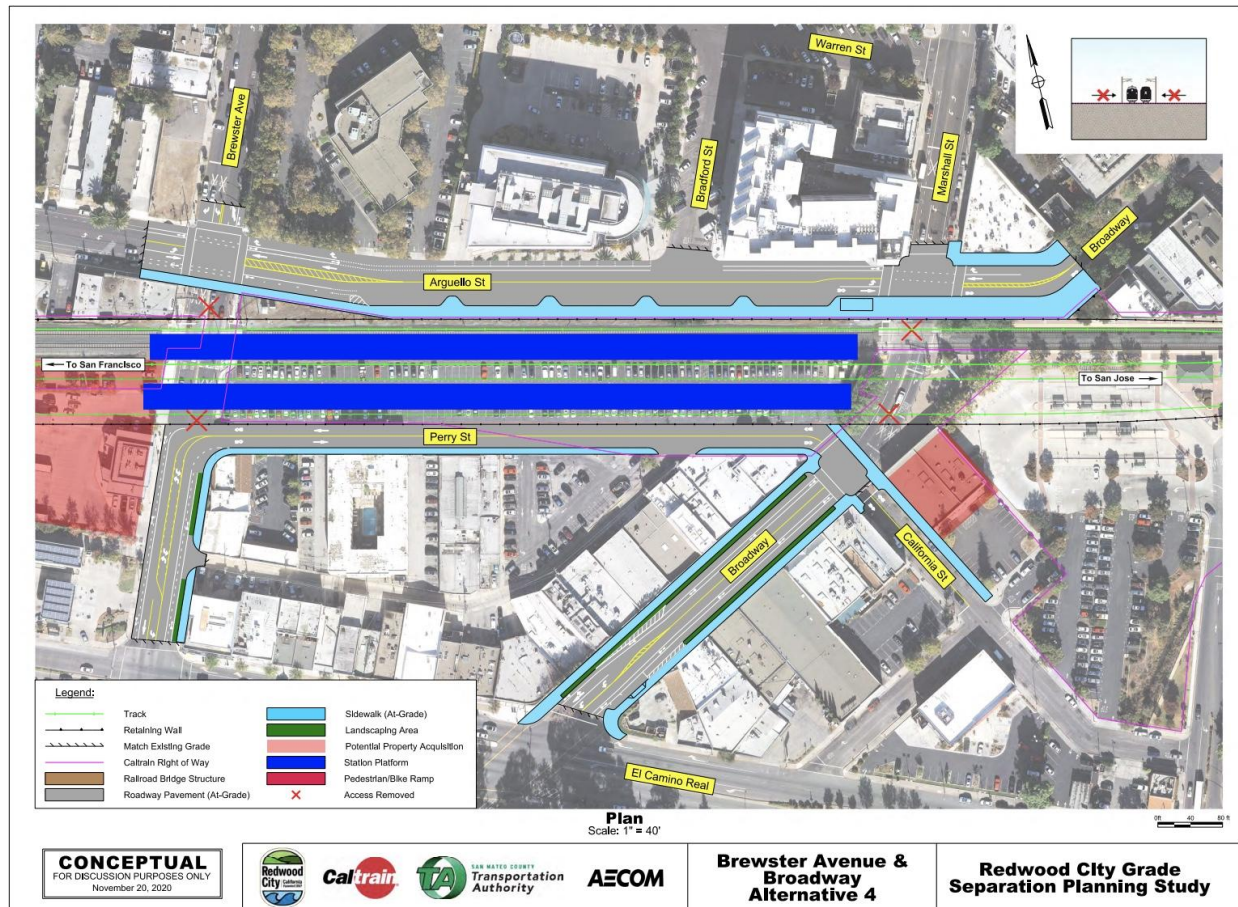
Changes to Broadway and Brewster Avenue for Design Alternative 4 (Redwood City, 2020).
